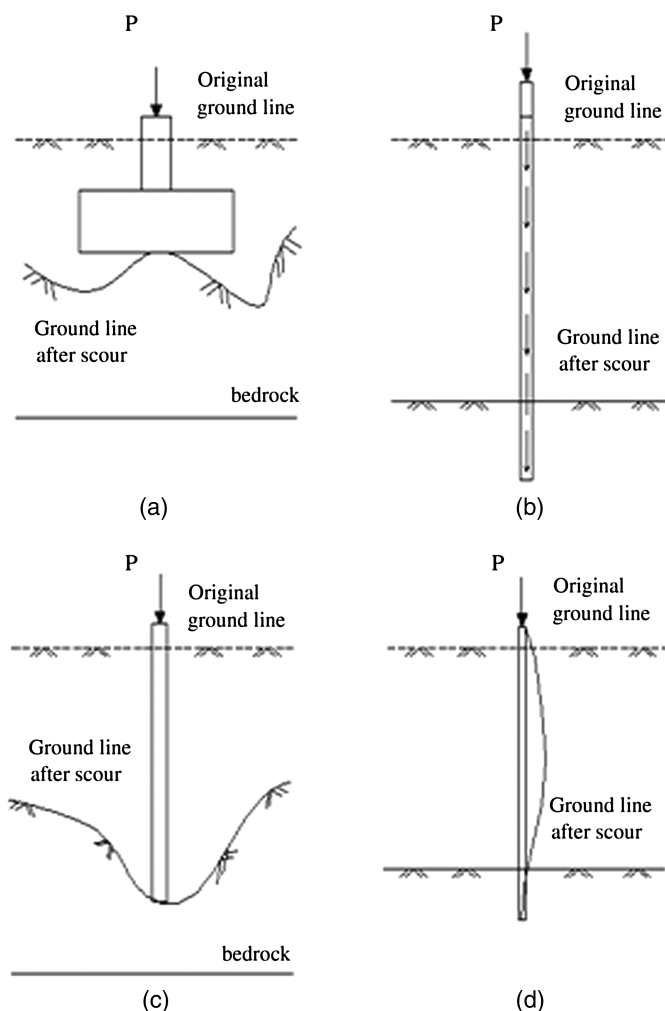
Vertical failure modes of bridge foundations: (a) undermining of footing base; (b) penetration of friction pile; (c) undermining of pile toes; (d) buckling of pile (reprinted from Lin et al. 2014, © ASCE)
